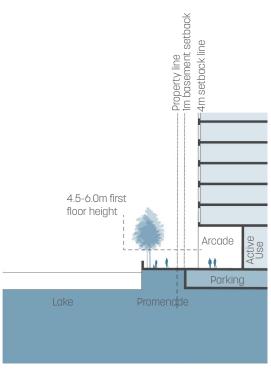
Section of Cultural Centre Building, located within Lakefront Park
